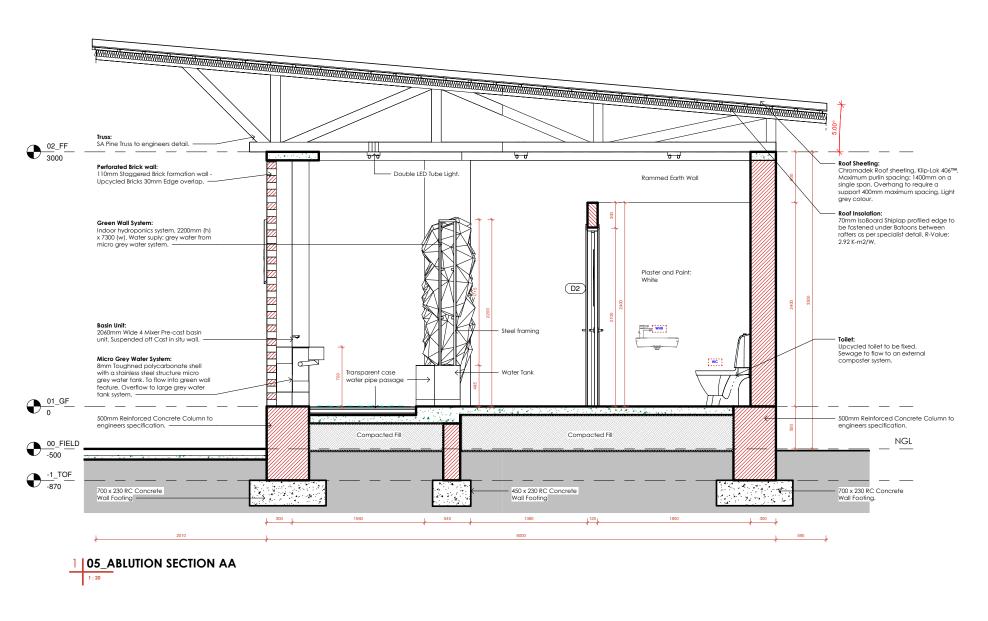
Ablution section AA: sectional detail interior, (Author, 2021)
